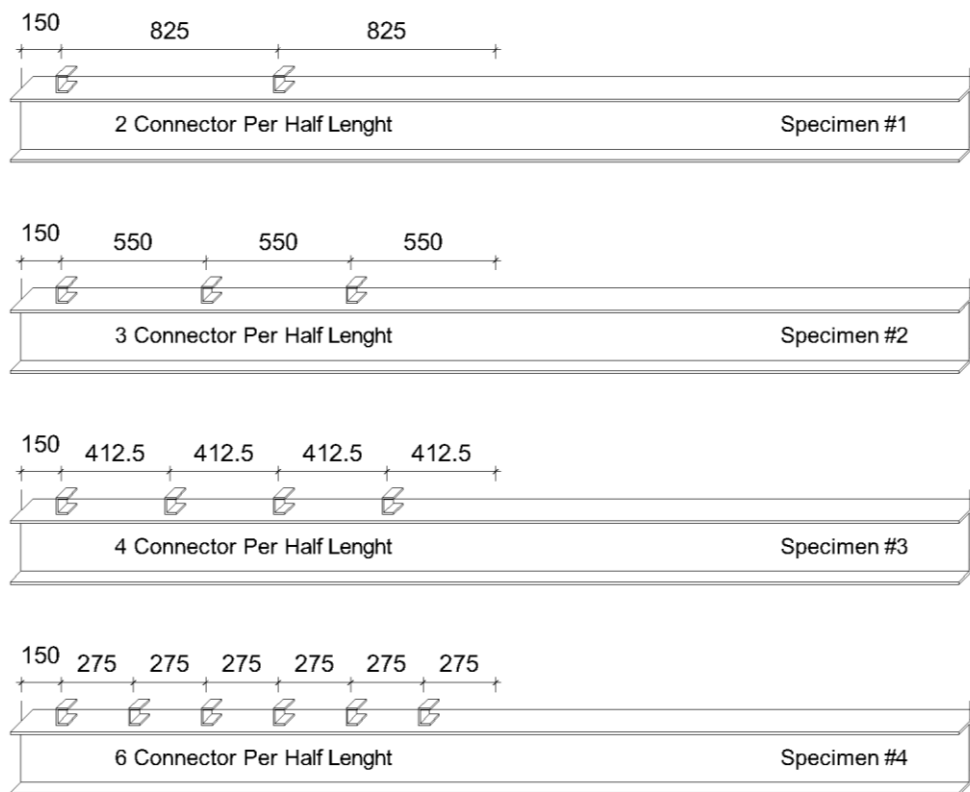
Full-Scale Beam Specimens (dimensions in mm)
